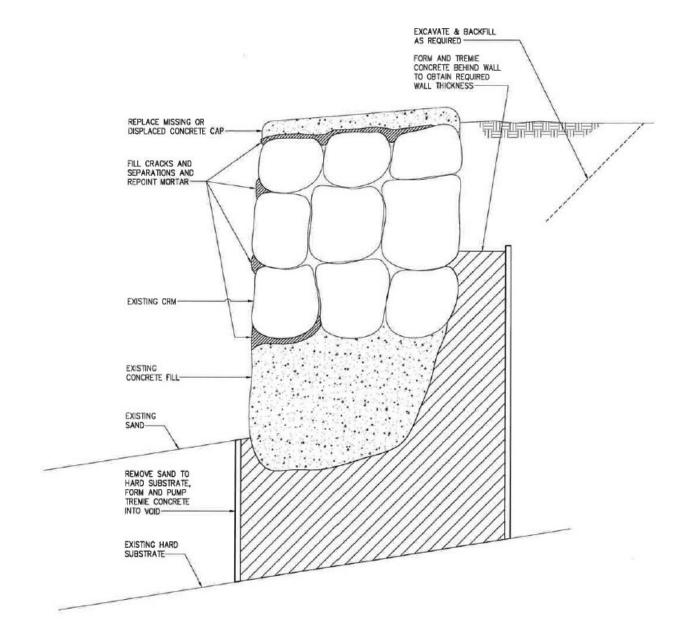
Conceptual scheme for seawall repairs in Sections 1 (west) and 3 (east)
